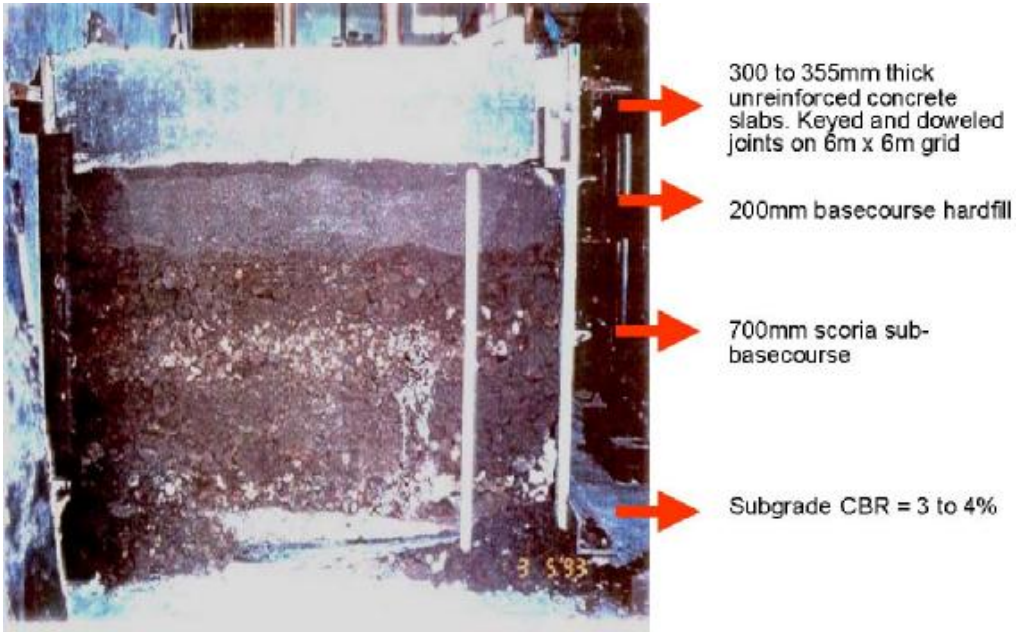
Old pavement structure (courtesy of Tom Watford, Auckland International Airport)
